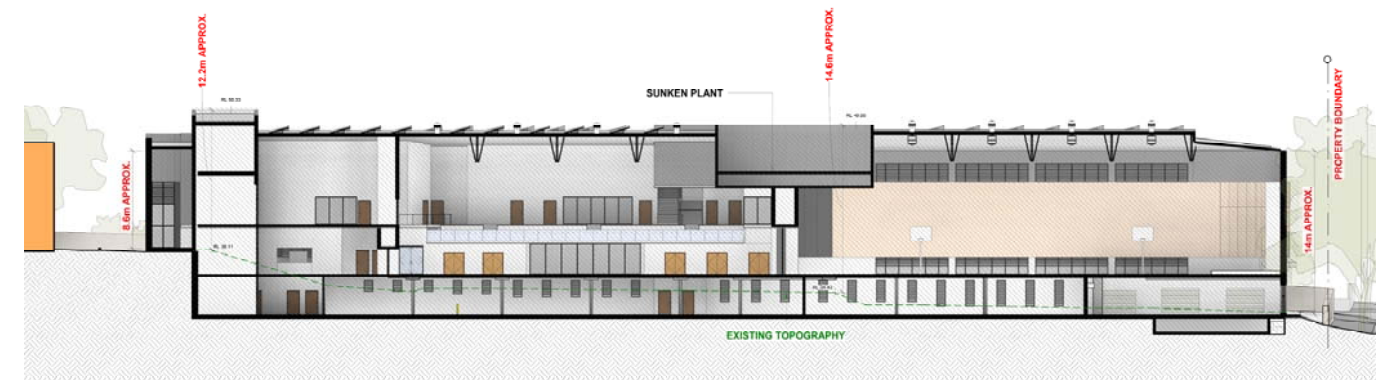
| Long building section showing how the building has been sunken into the ground (5.5m) and the roof plant sunken into the roof to reduce the overall height
